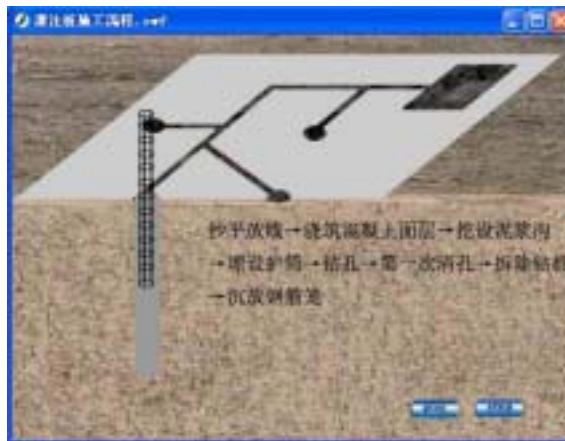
The eighth step of bored pile construction technique is to install steel reinforcement cage.
